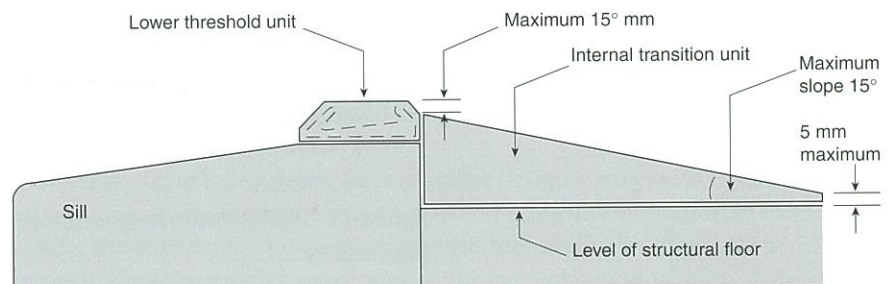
Detail of threshold and internal floor intersection . Adapted from *Accessible thresholds in new housing
